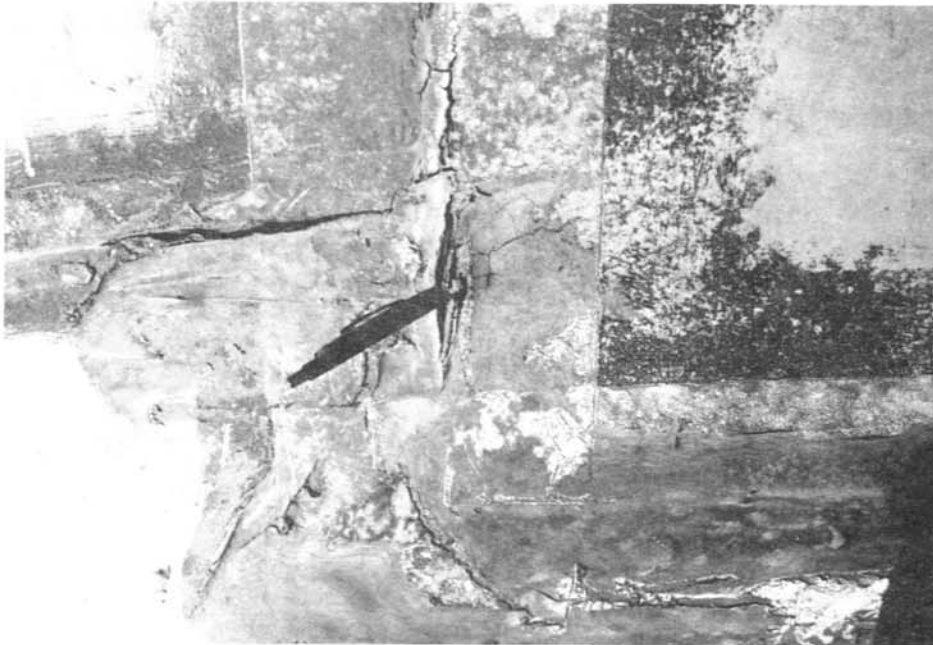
Poor adhesion at intersection of two seams in rubber sheet roofing. Asphalt mastic repair cracked. Rubber calking should be used.
